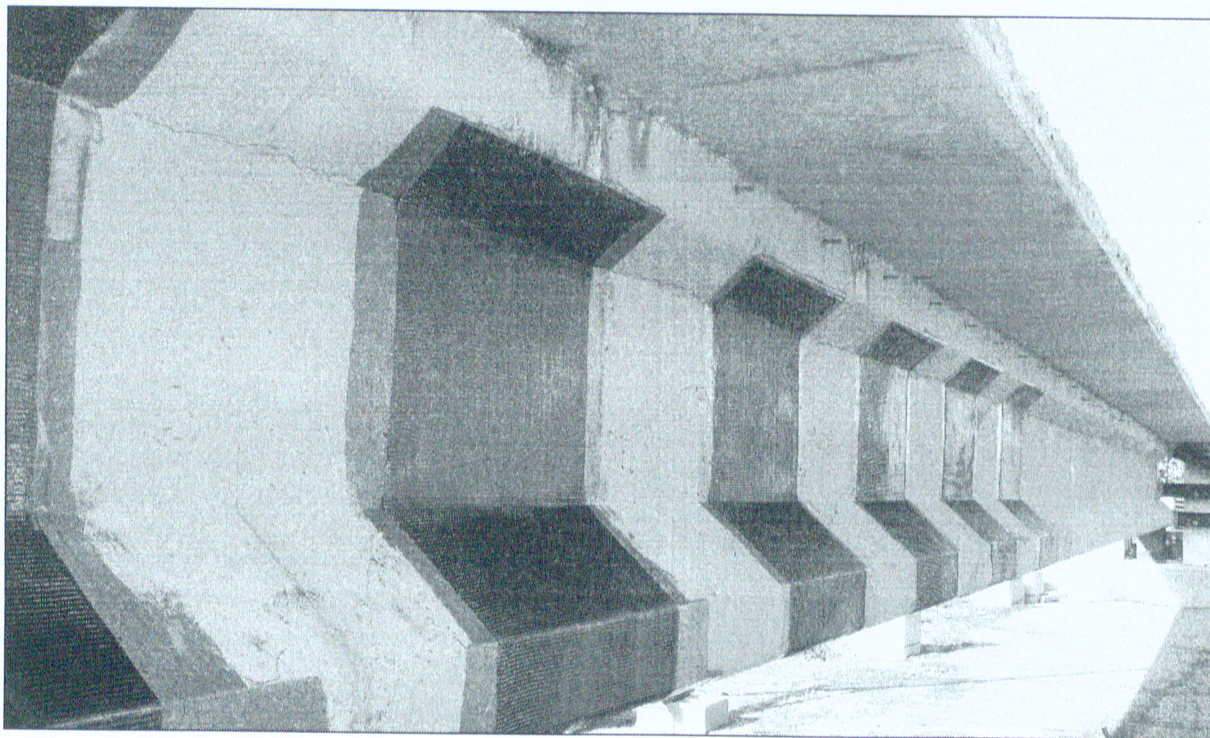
First layer of CFRP U-wraps on one half the girder
